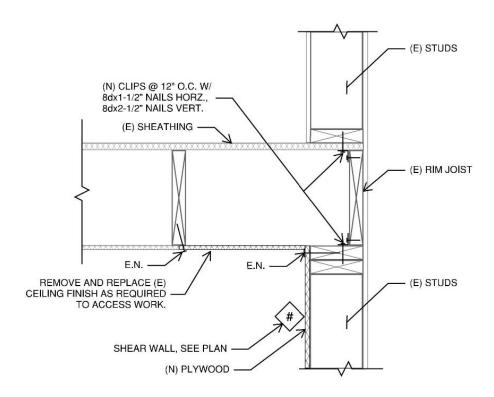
Load-path connection at the top of the retrofit shear wall.
